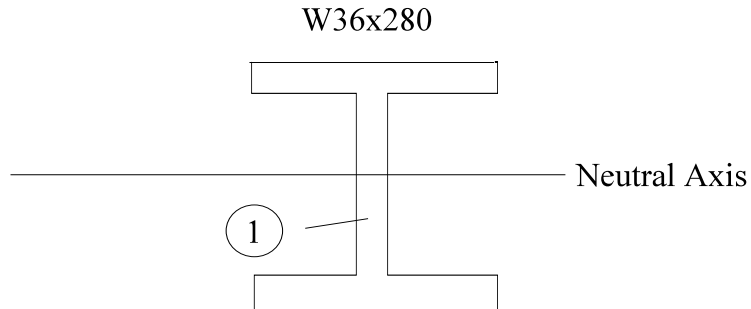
Non-composite Concrete Bridge Deck, Detail No. 5
